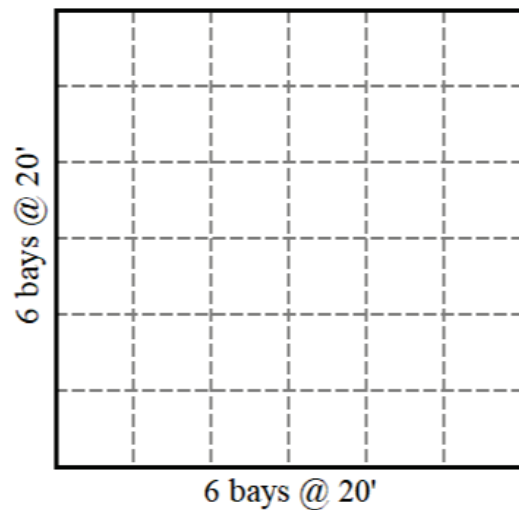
Baseline RC moment frame building typical 4-story plan.
